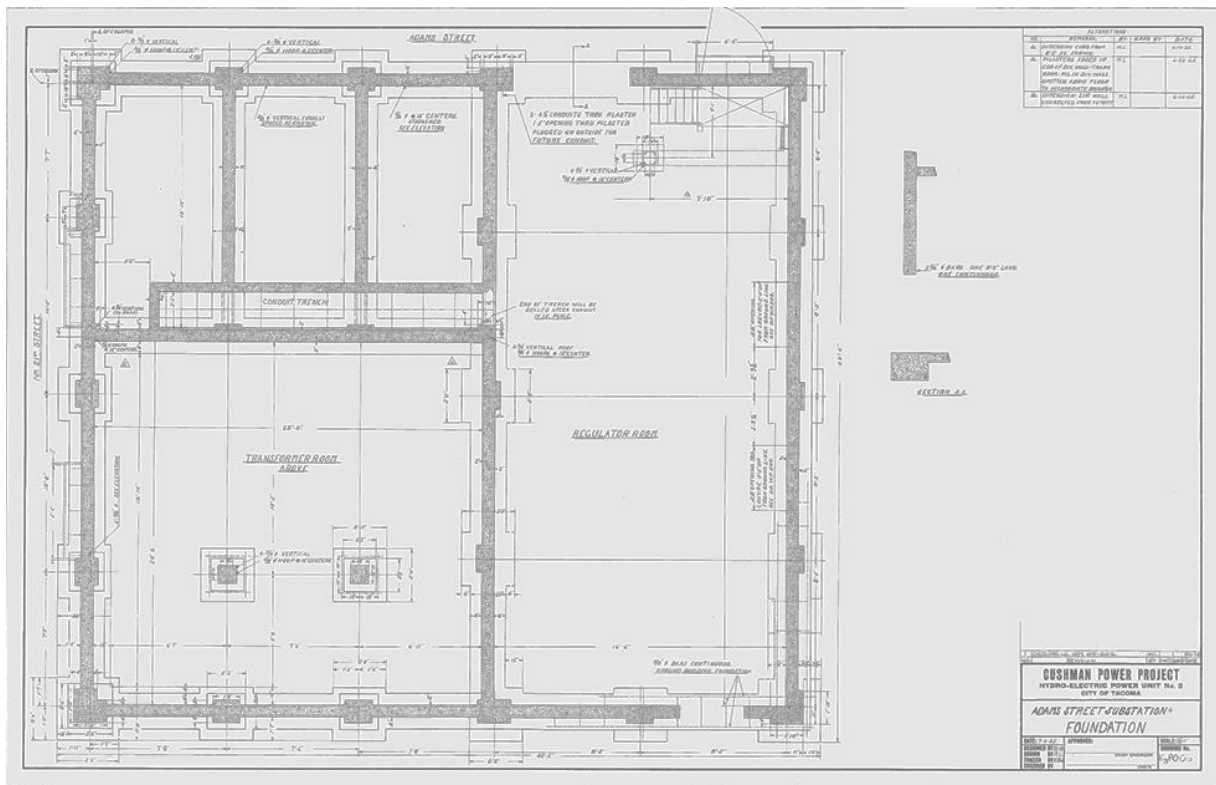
Adams St. Substation, foundation plan, 1925. Courtesy of Tacoma Power.
